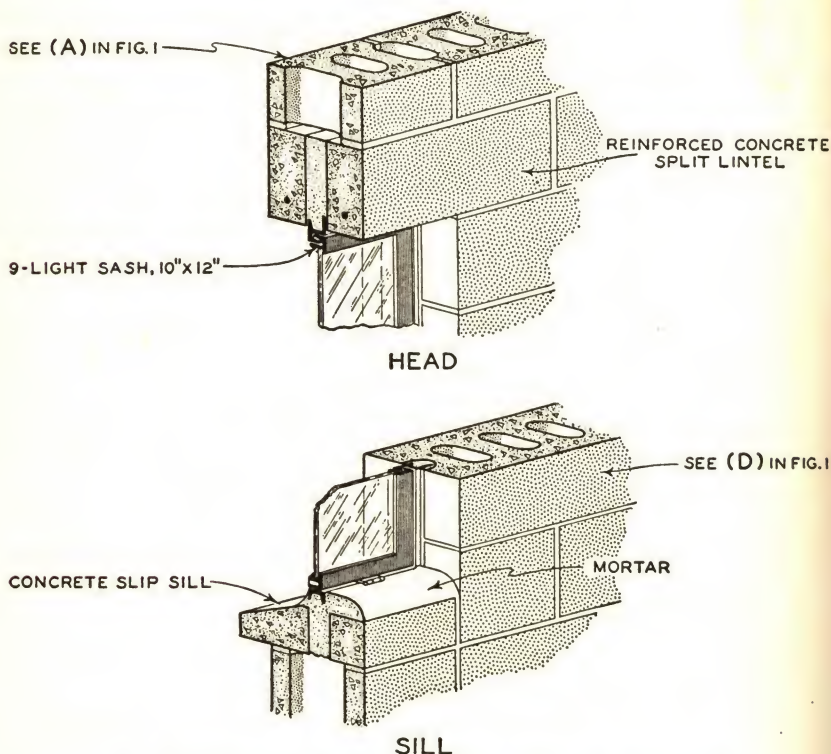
Head and Sill Sections of a Simple Metal Sash Barn Window
